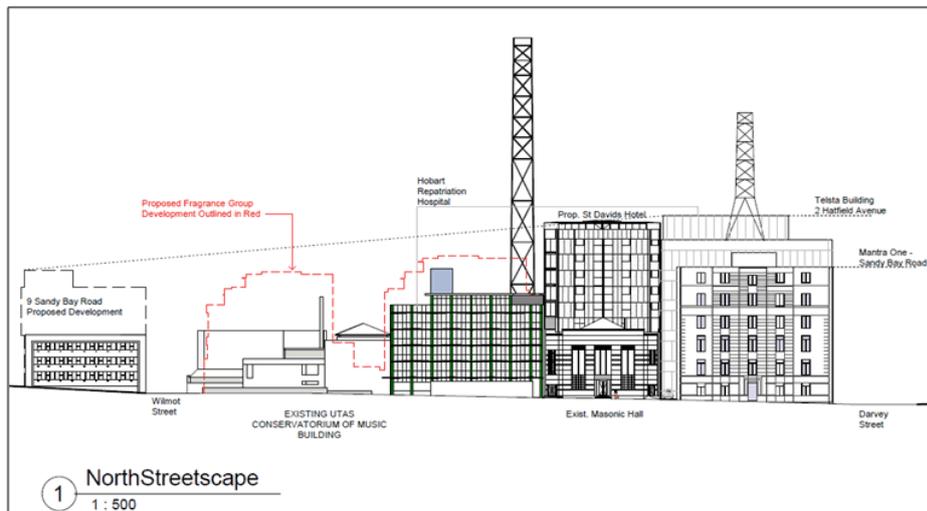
Streetscape elevation along Sandy Bay Road (source: Architects Designhaus)
